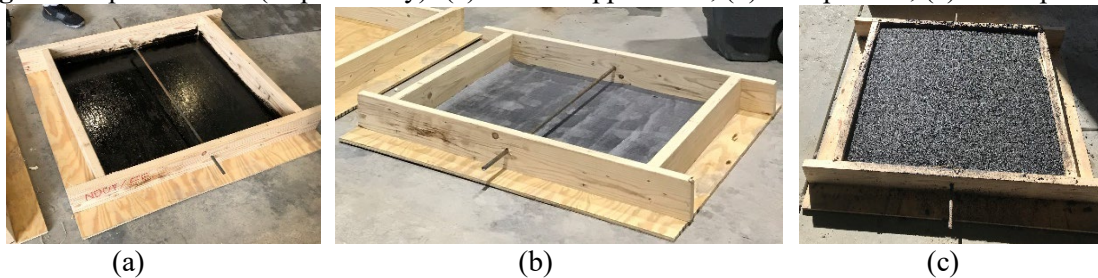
Specimen A2 (Asphalt with rebar): (a): Primer, (b) Membrane, (c): Cast Specimen
